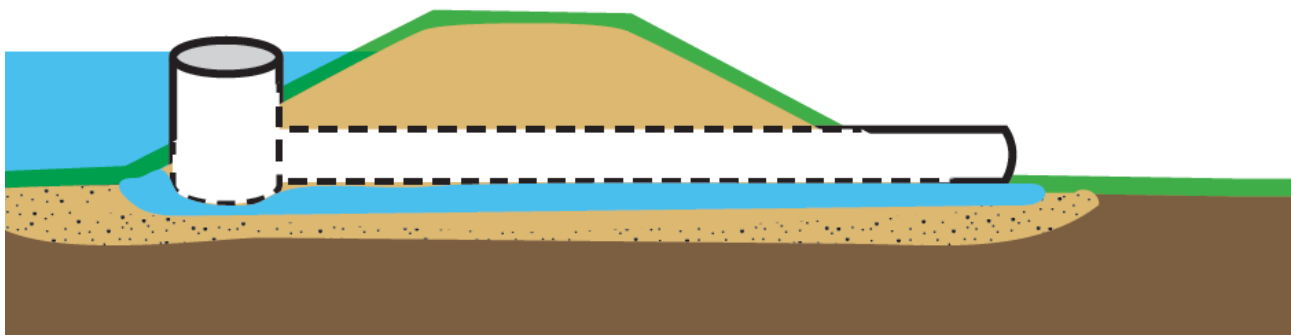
Piping erosion occurs due to poor pipe installation and can cause embankment failure.
